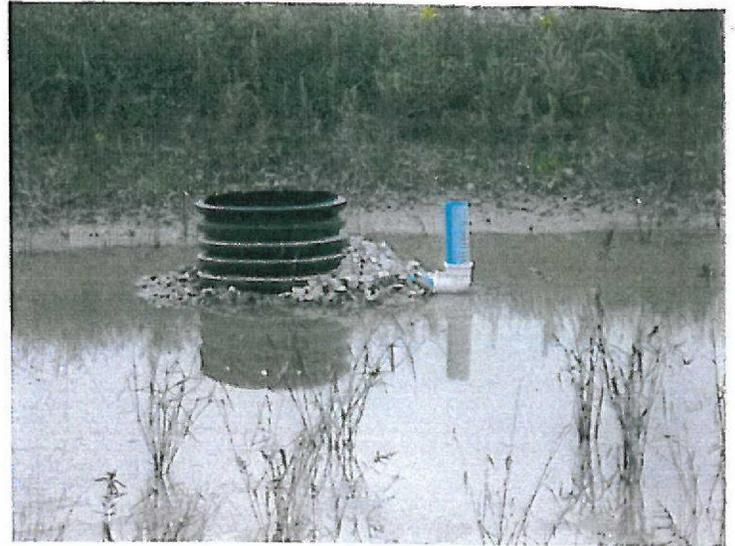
& 48. SB-1 has been installed and appears to be effective. However, the outlet structure installed does not match the design specified in the SWP3.
